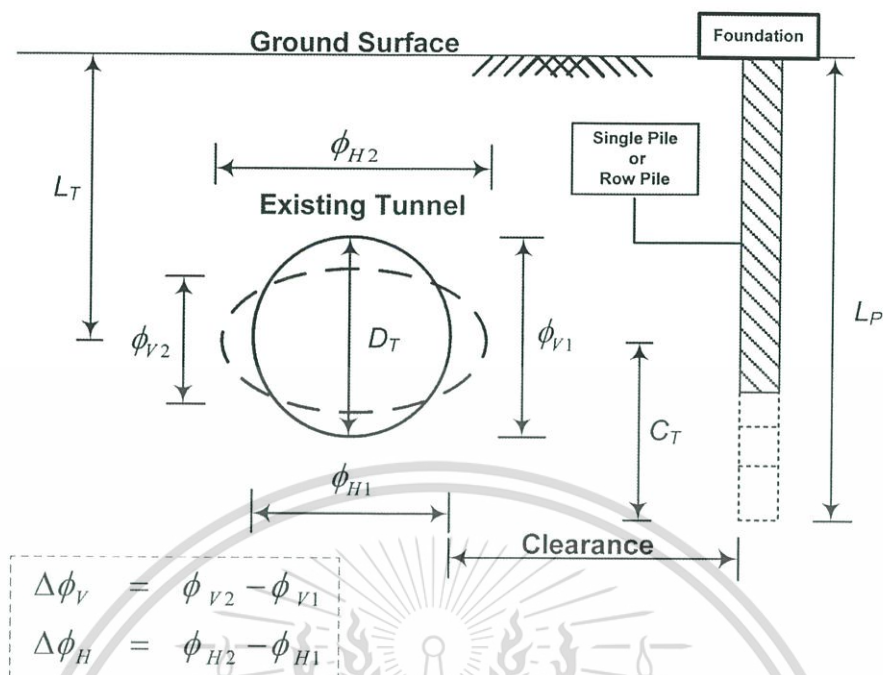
Illustration of piles under loading adjacent to an existing tunnel (D_T = tunnel diameter; L_T = tunnel depth; L_P = pile tip; C_T = vertical distance from centre of tunnel to pile tip; ϕ_H and ϕ_V = tunnel deformations).
